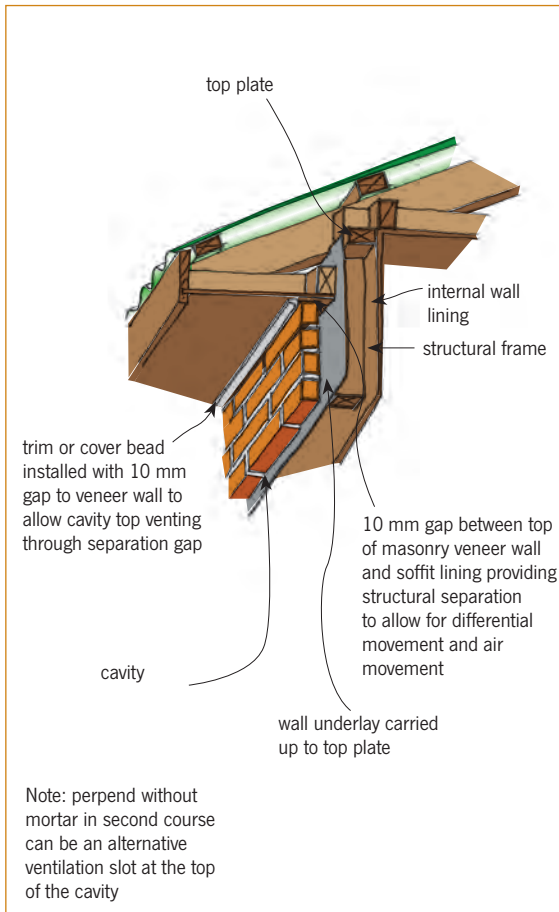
Top ventilation openings for buildings with an eaves overhang.
